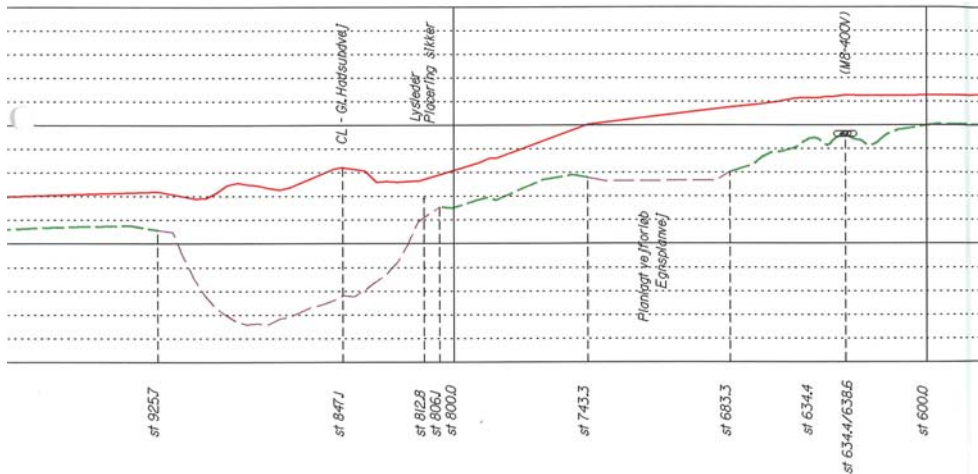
Longitudinal profile of direct-buried underground cable and sections using directional drilling and installation in pipes
